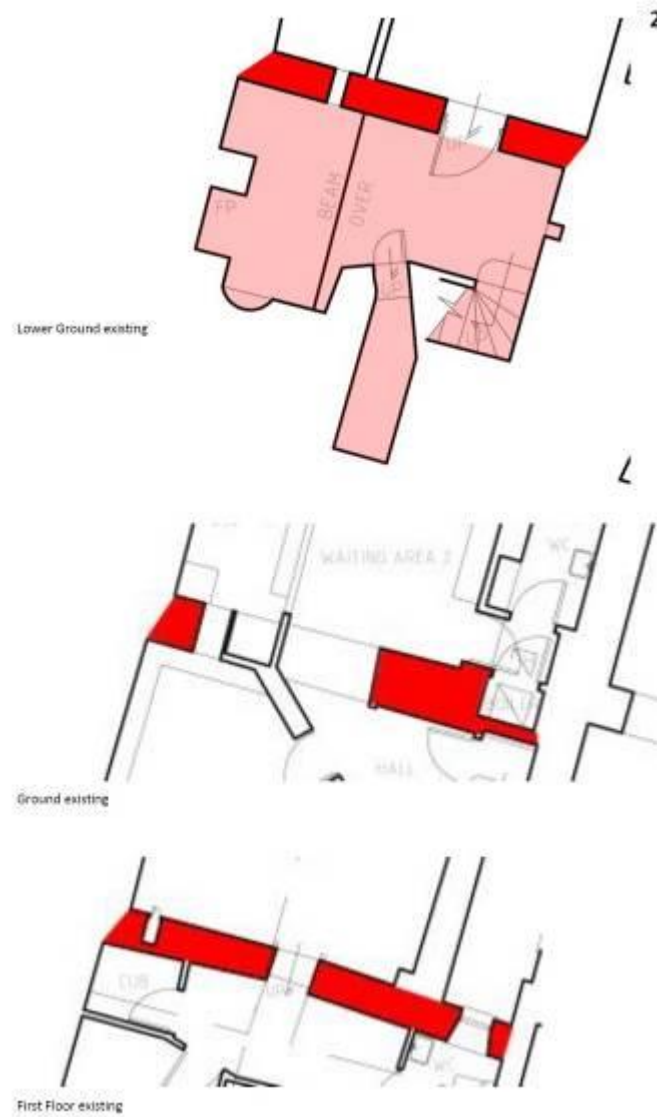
Plans of medieval wall at No 6 Castle Terrace
